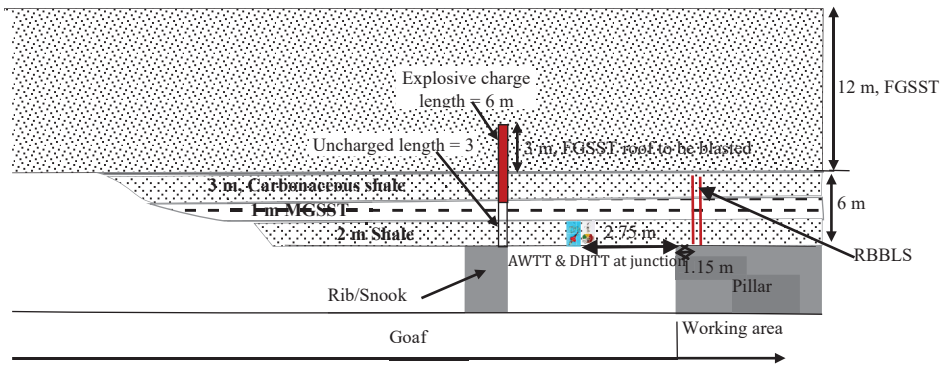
Sectional view of the drilled hole with explosive charging pattern.
